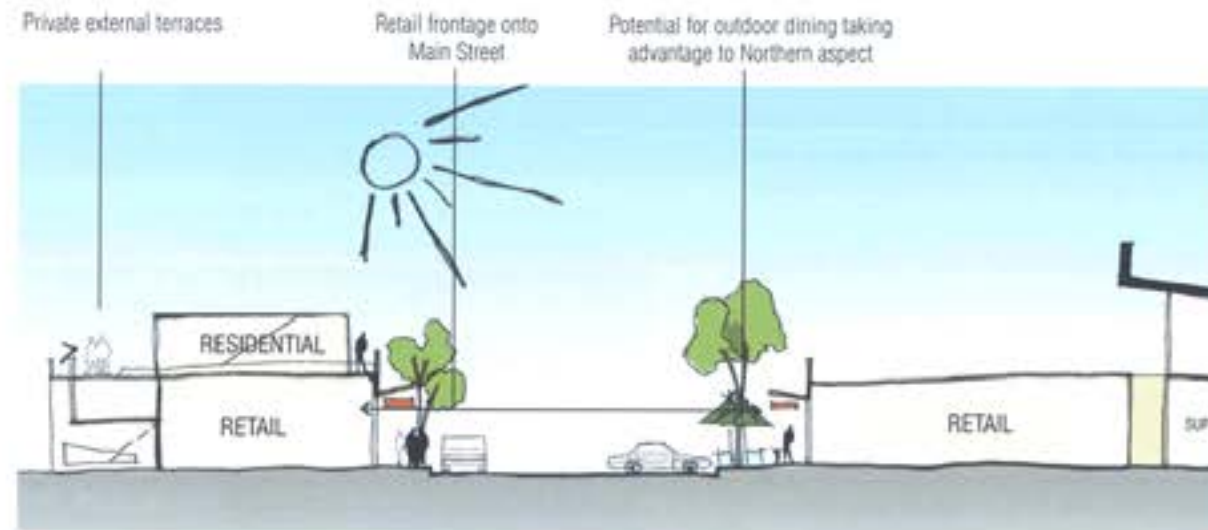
Indicative section through Main Street retail and shop-top dwellings (Source: HASSELL, 2008)
